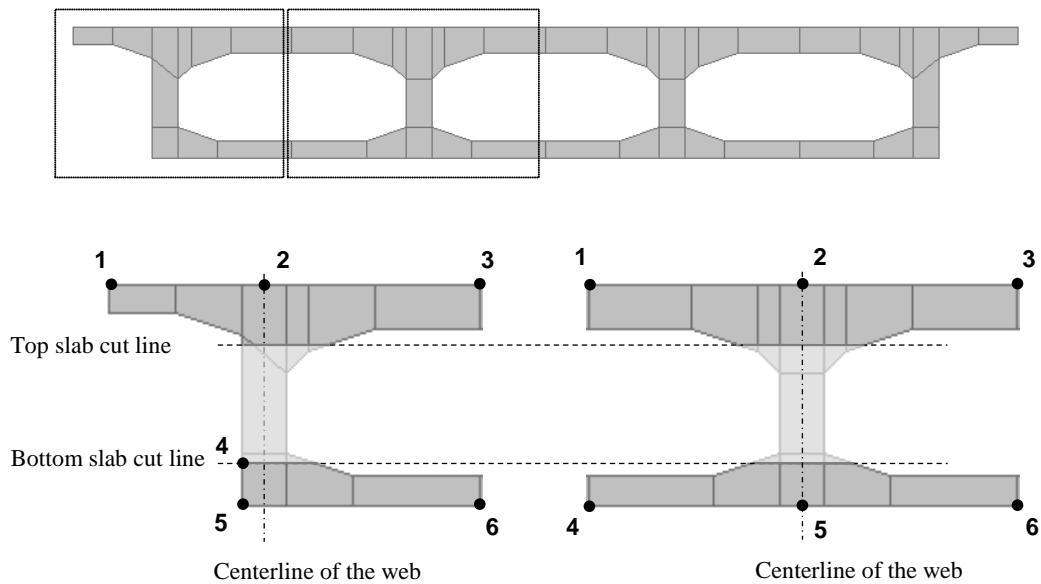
Bridge Concrete Box Deck Section - External Girders Vertical
